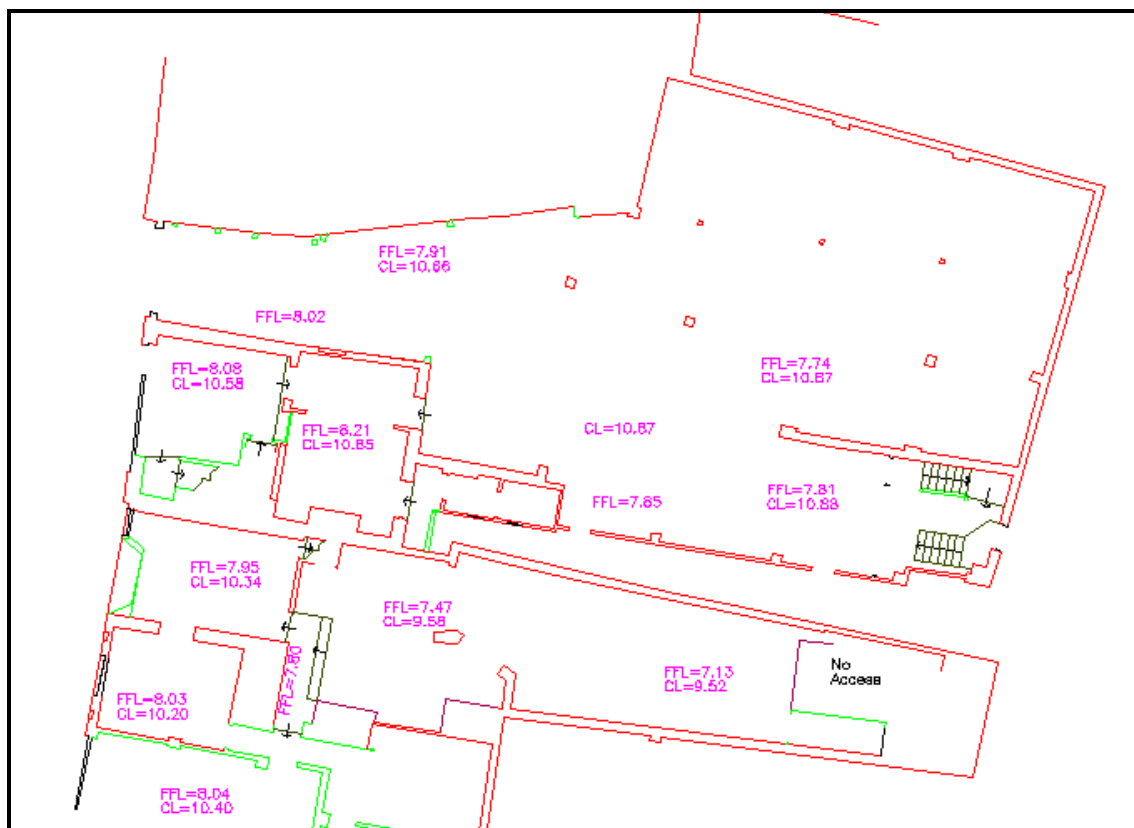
Existing Finished Floor Levels Units 6-8 and 10
